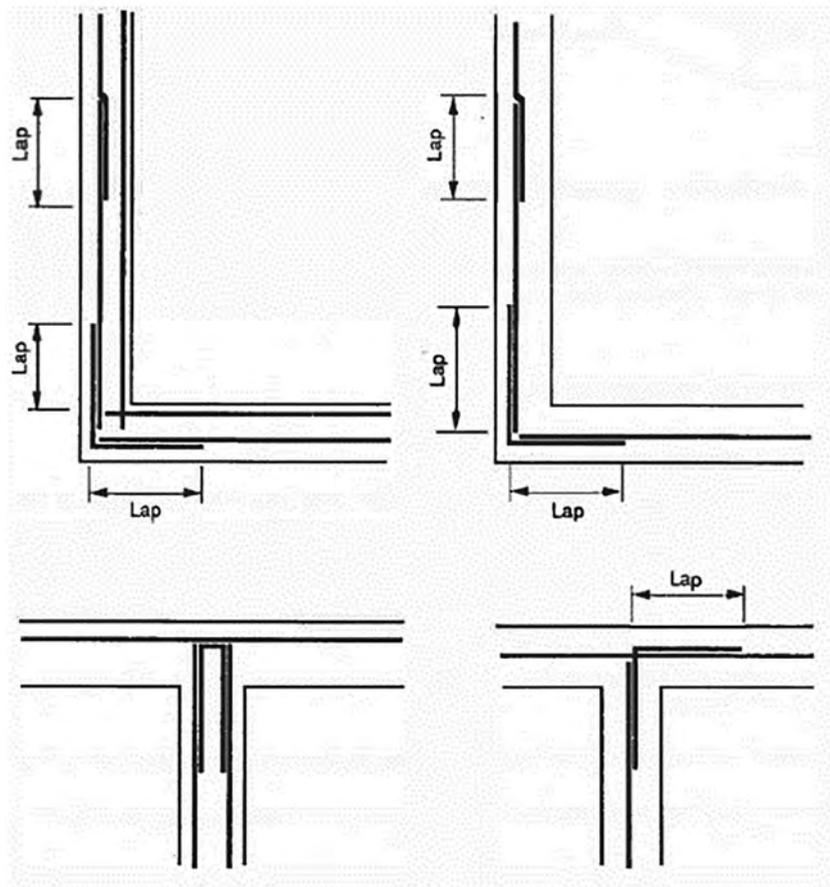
REINFORCEMENT AT FOOTING INTERSECTIONS
